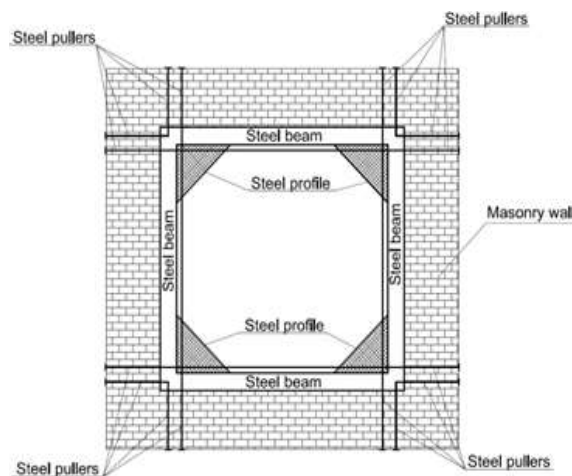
Consolidation of towers on the inside with steel structure [4]
